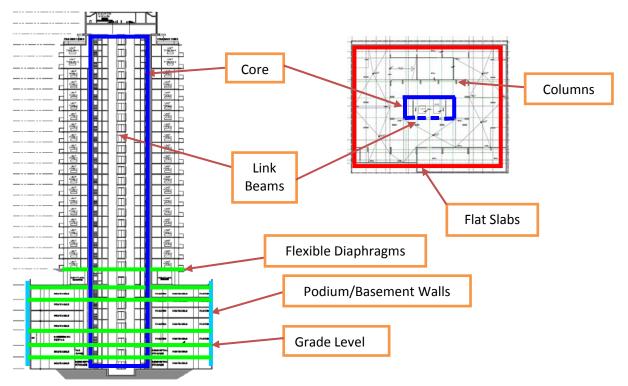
Elevation and plan layout of a typical tall building and its main structural components designed with a performance-based approach in California
